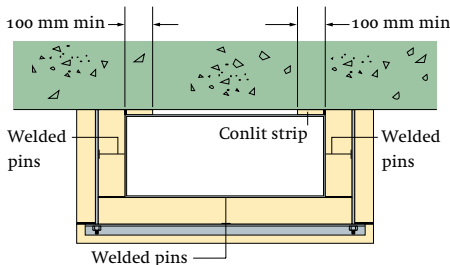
Three sided protection for rectangular ducts, using welded pin fixing method
